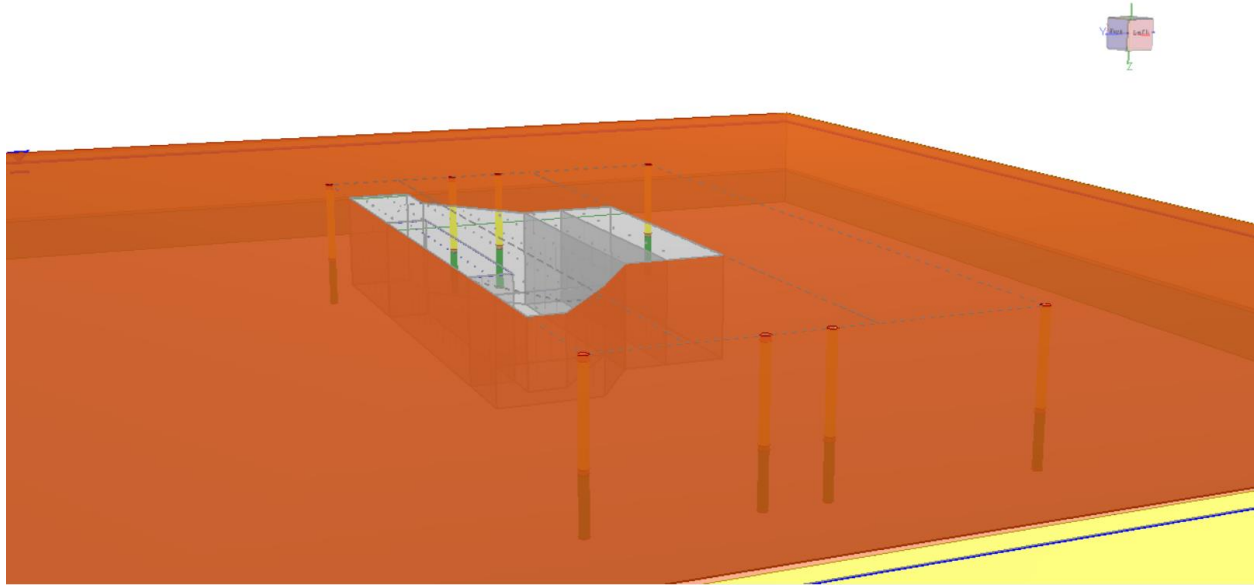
1D Consolidation North Abutment In-situ Stage
